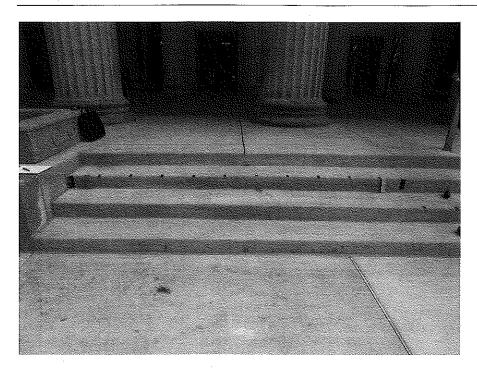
Overall photo at north section Stairway A, measurements first 10 feet at third riser
